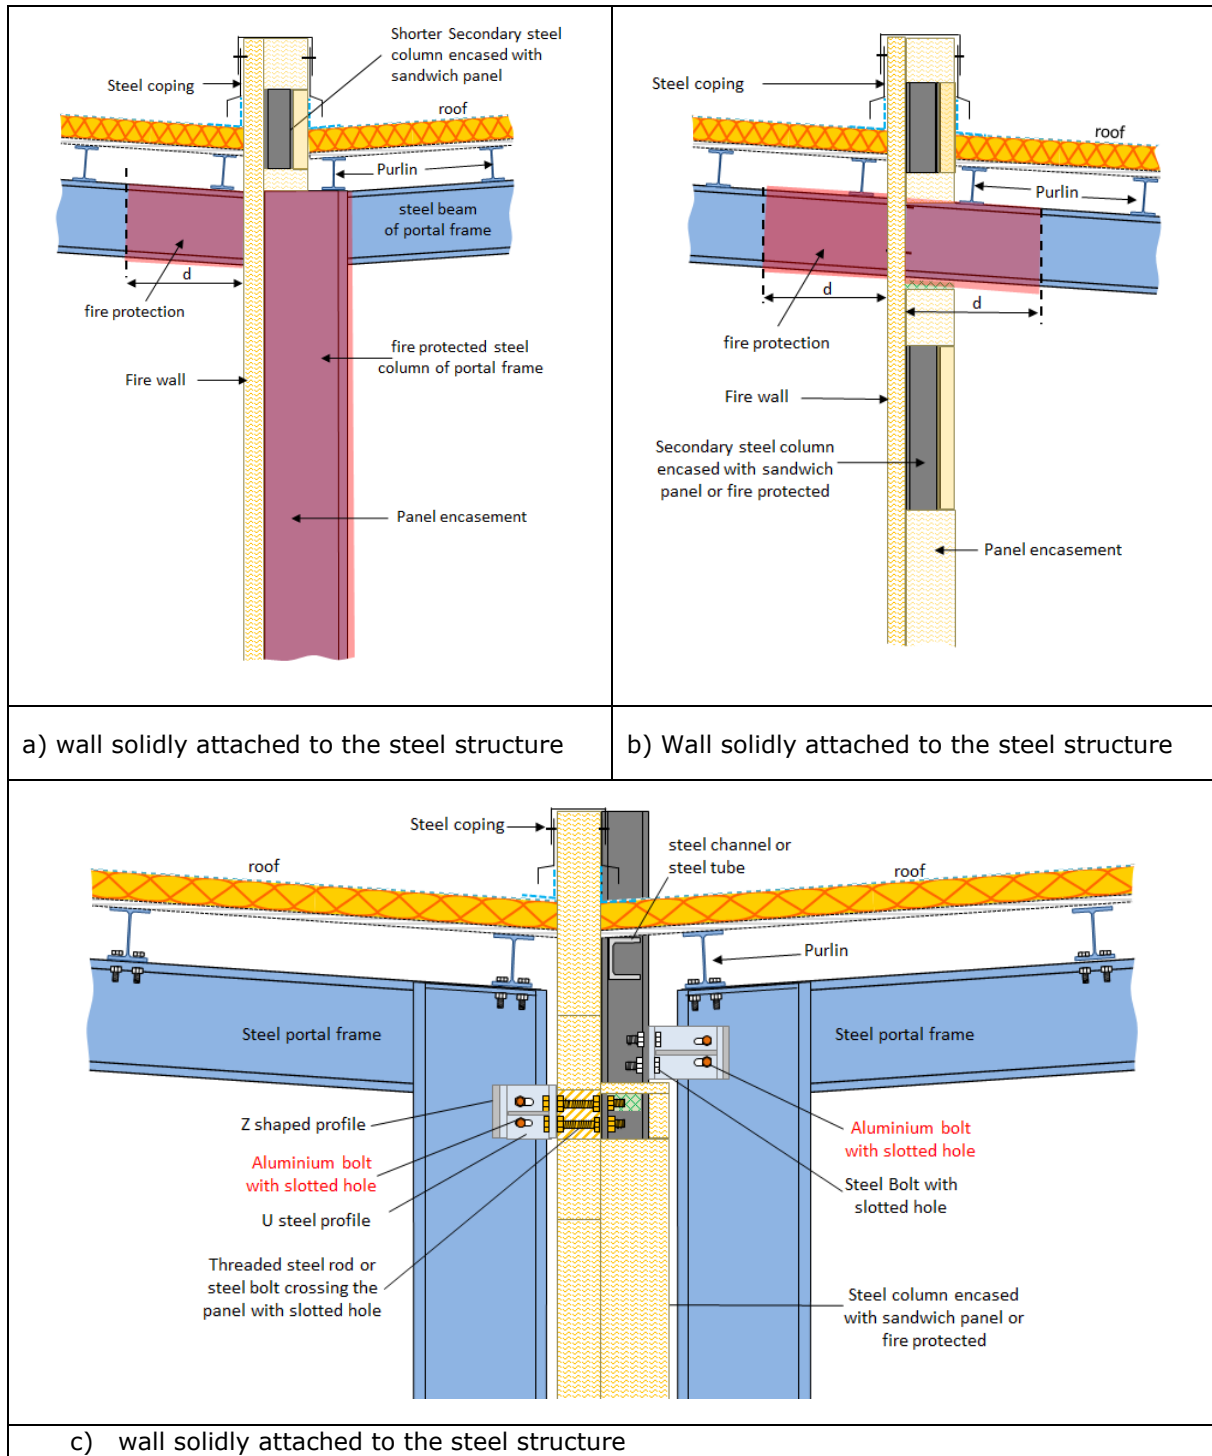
Schematic views for a fire wall perpendicular to portal frames, inserted into a row of columns and extending beyond the roof – Portal frame columns with standard fire protection
